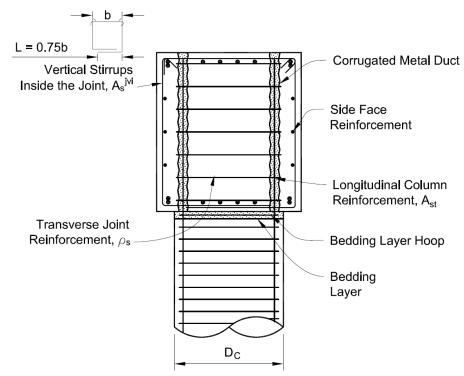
Grouted Duct Joint Shear Reinforcement Details (Section)—SDC B
